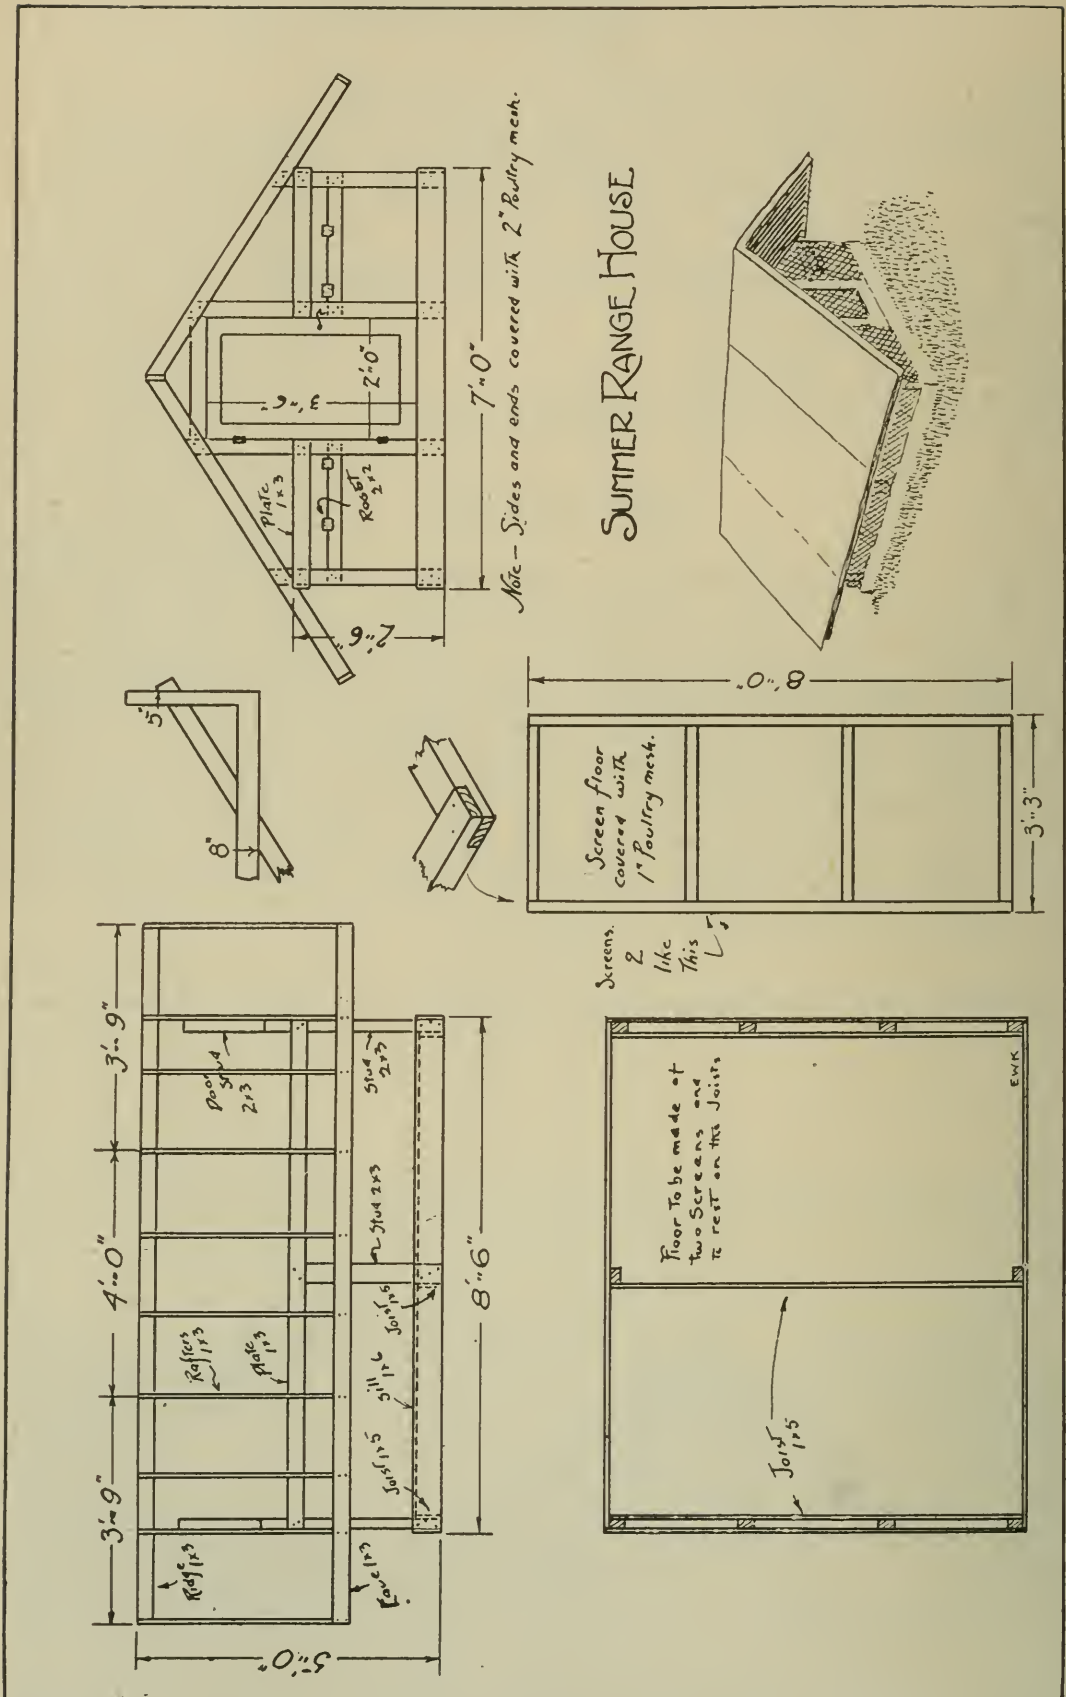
Plans and construction detail for range shelter shown in Fig. 41.
